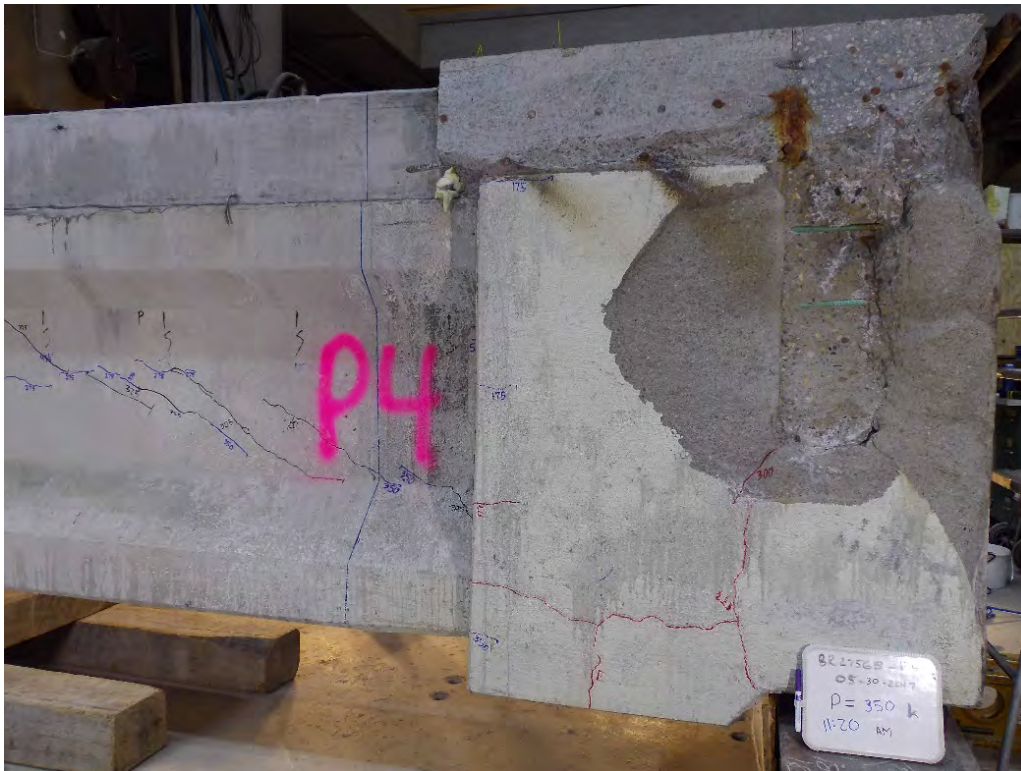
Girder P4 Northside Section 1-Section 2 $P=350$ kips
